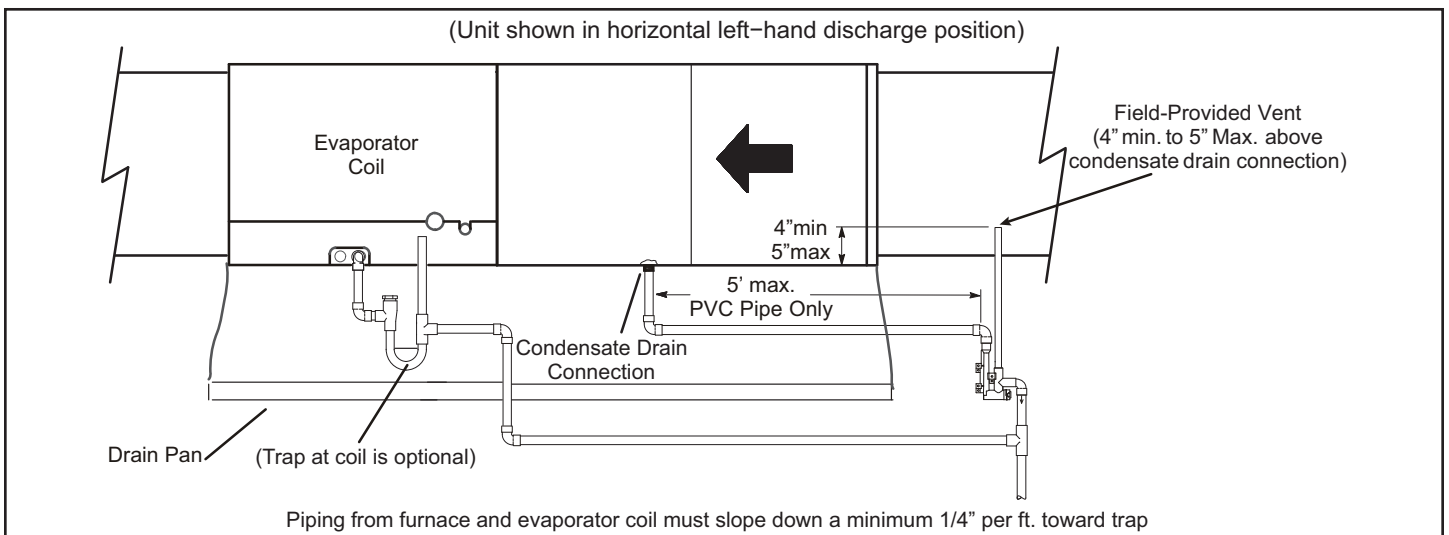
Furnace with Evaporator Coil Using a Common Drain
